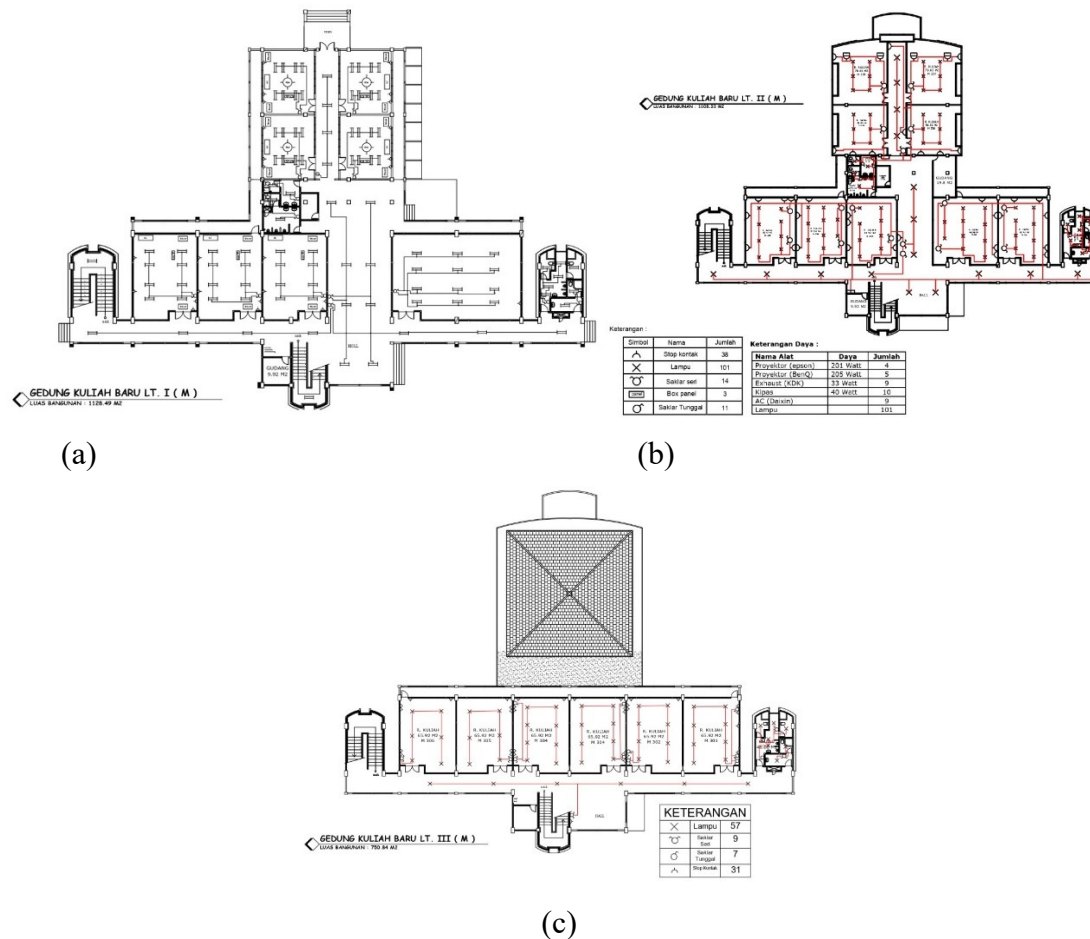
a) Plan of M building 1st floor, b) Plan of M building 2nd floor, c) Plan of M building 3rd floor
